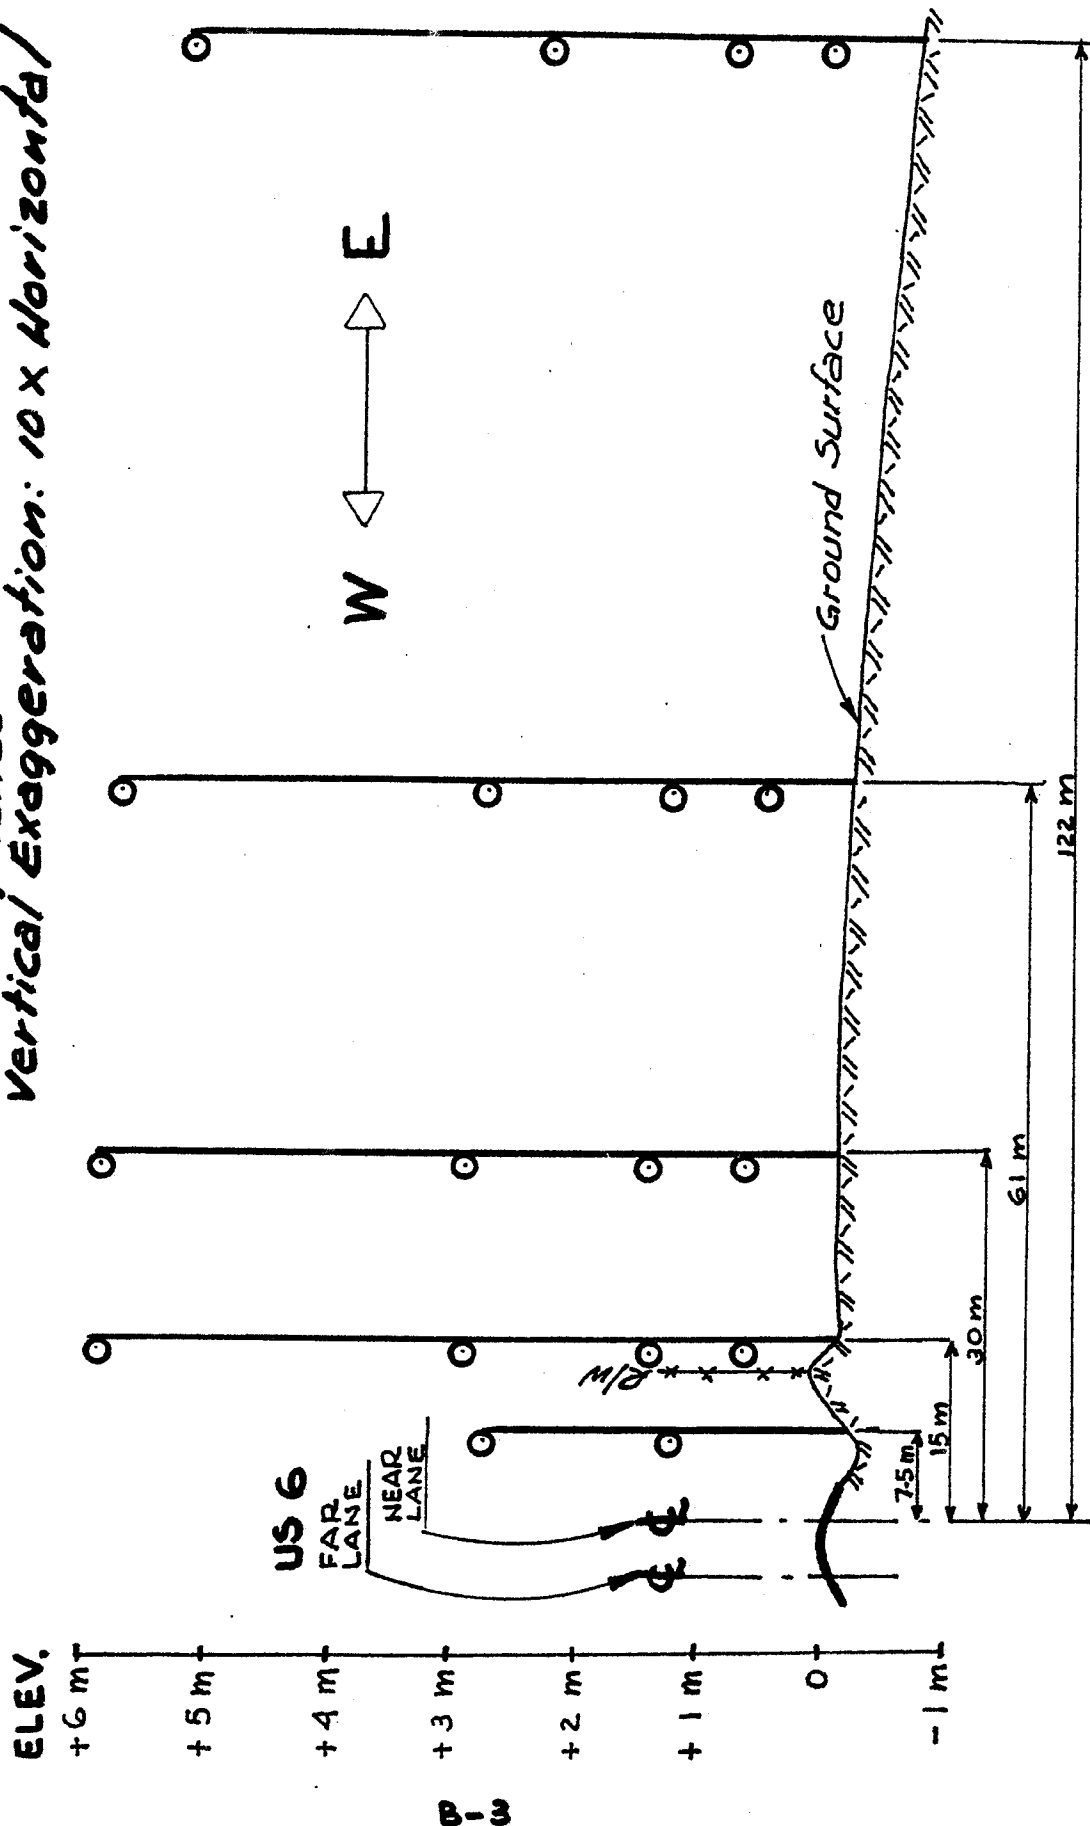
Cross Section of Site G-3 "LEMOORE"
